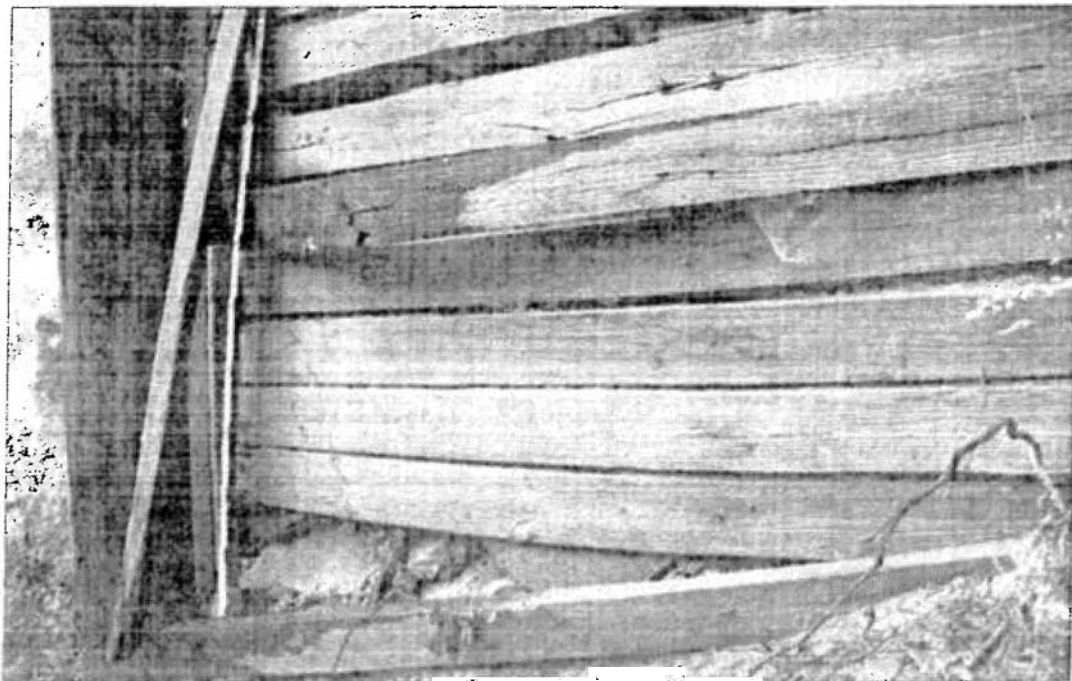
Element 476 - Fractured Timbers at Northeast Wing Wall
